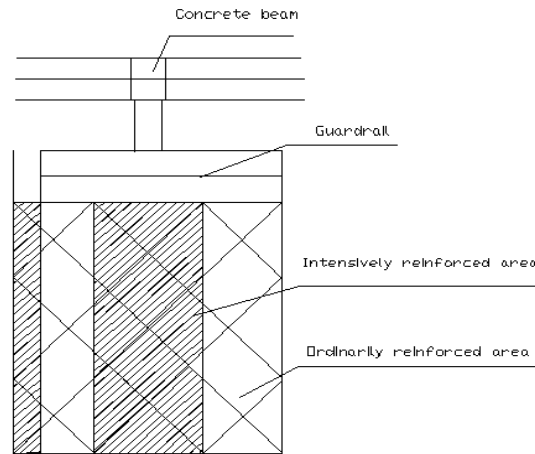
Schematic diagram of bowl-coupler steel bracket layout
